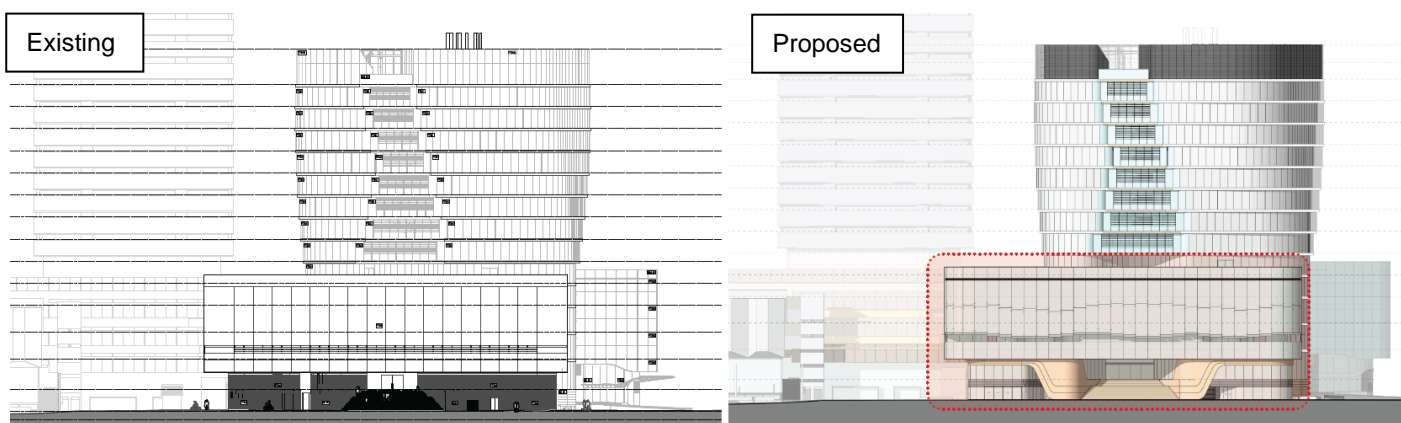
Amendments to Alumni Green Façade, demonstrating extension of 'sandstone' finish element
